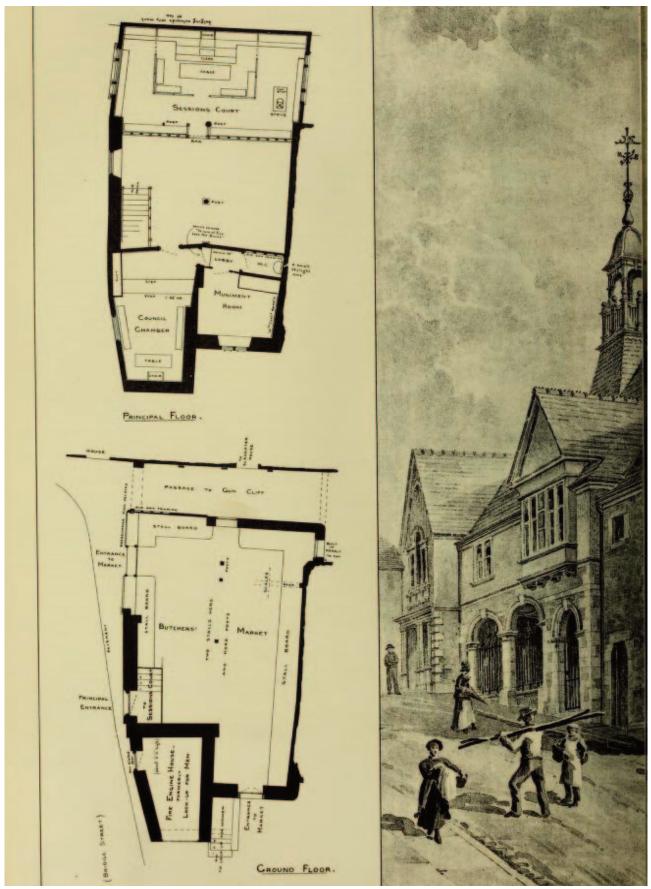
The plan of the Guildhall prior to alteration. Structural elements are shown in black including two support posts below the east (top) bay. Note the position of the original stairs.
